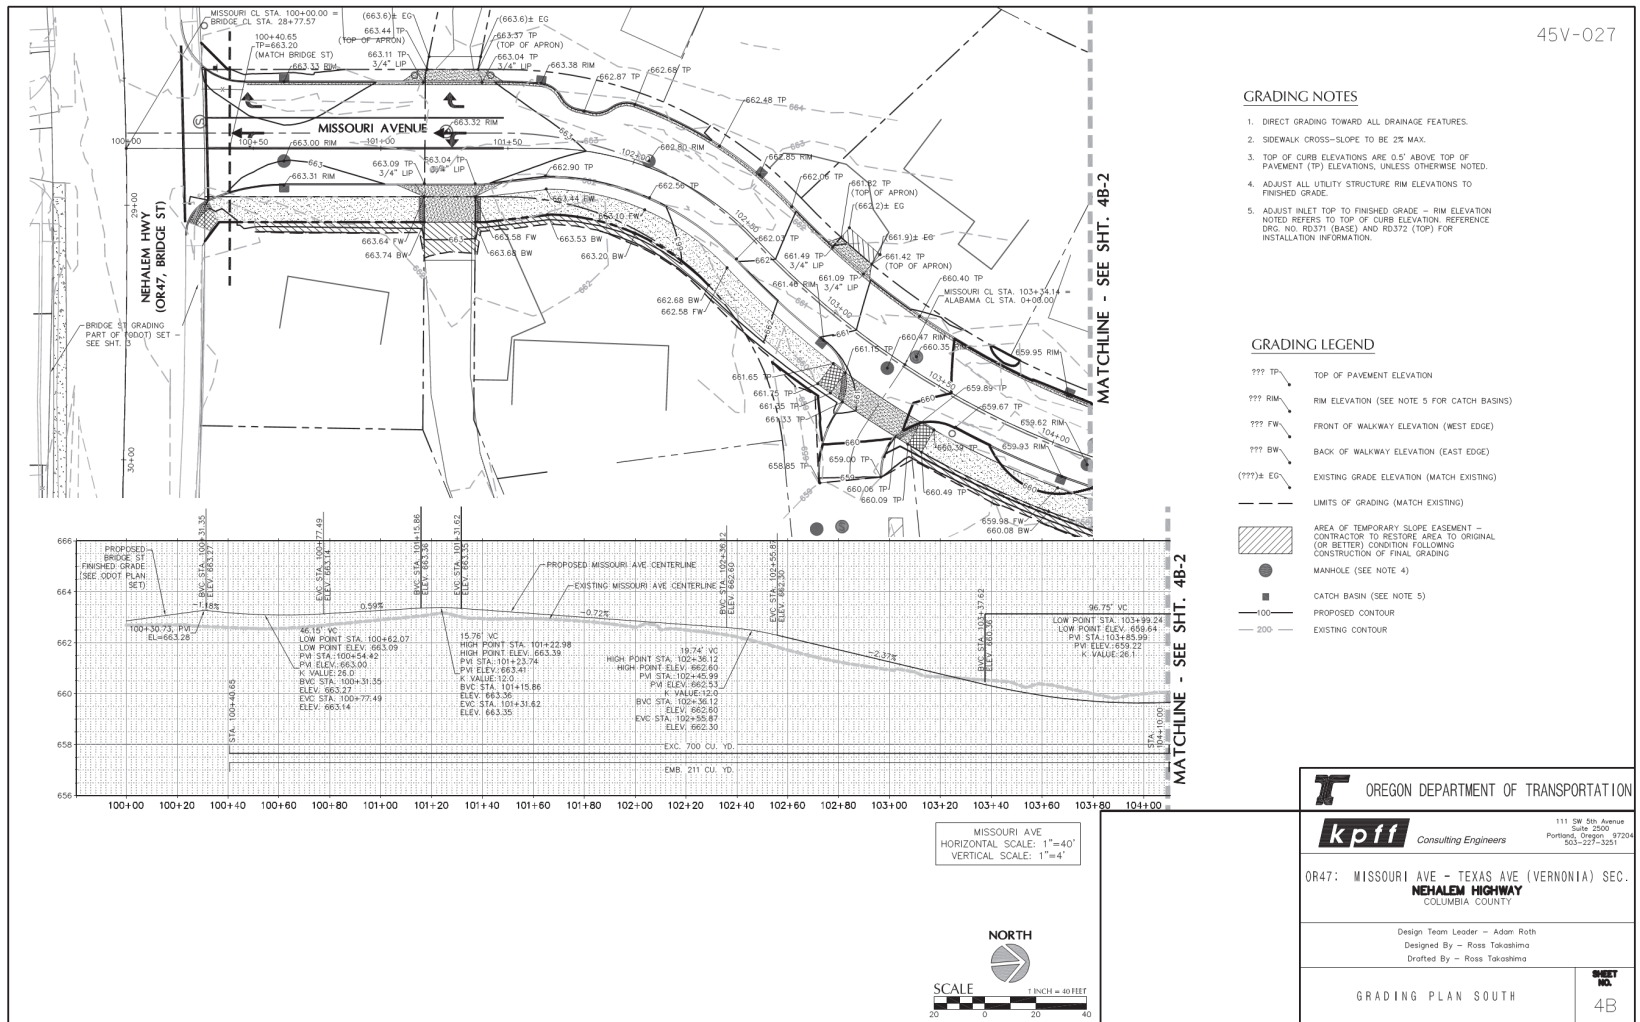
A grading plan and profile used to show existing and proposed topography.
